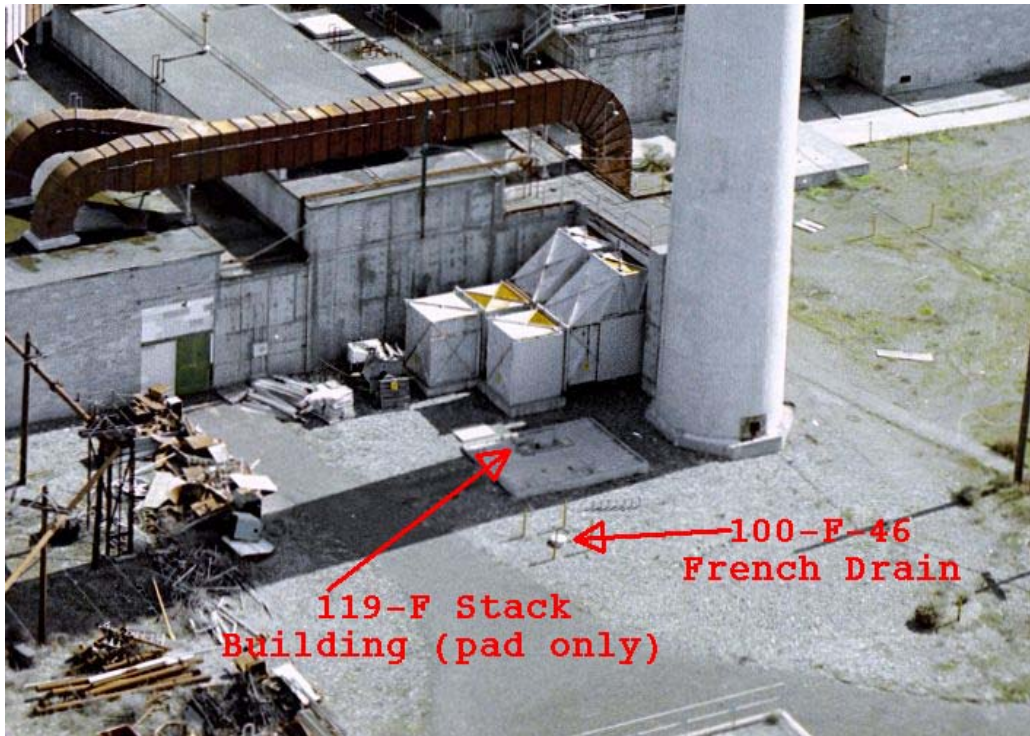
Closeup View of the 119-F Building Pad and French Drain (Surrounded by Concrete Posts) (July 25, 1983).
